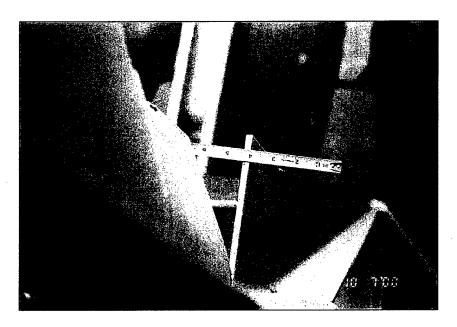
2 inch deflection in top right vertical bracing at middle girder.
